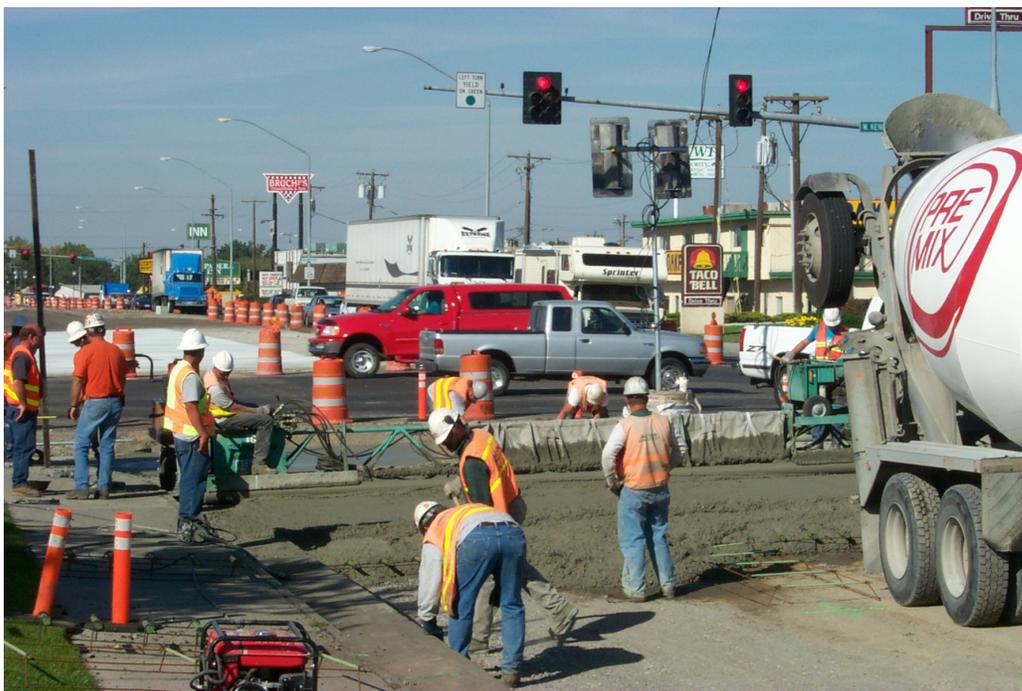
Construction of the approaches while under traffic on SR 395 at the SR 395 and West Kennewick Avenue intersection.
